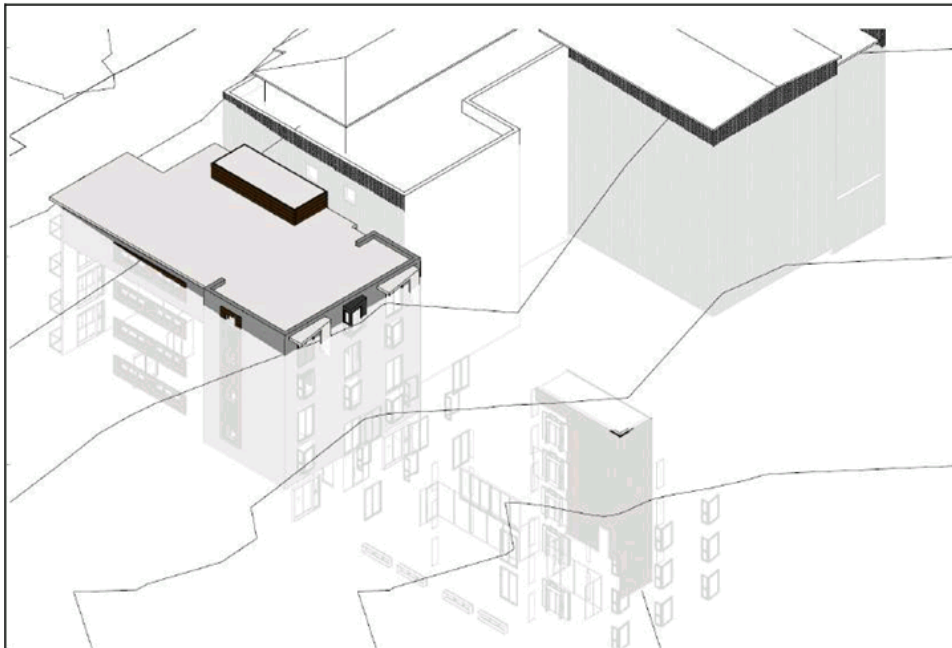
Drawing showing where the proposed development intersections the 14 metre height plane.
